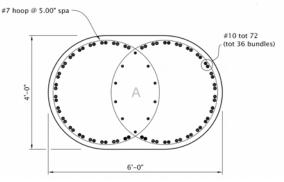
Cross-section of Caltrans highway bridge column (Mackie & Stojadinovic, 2005)
